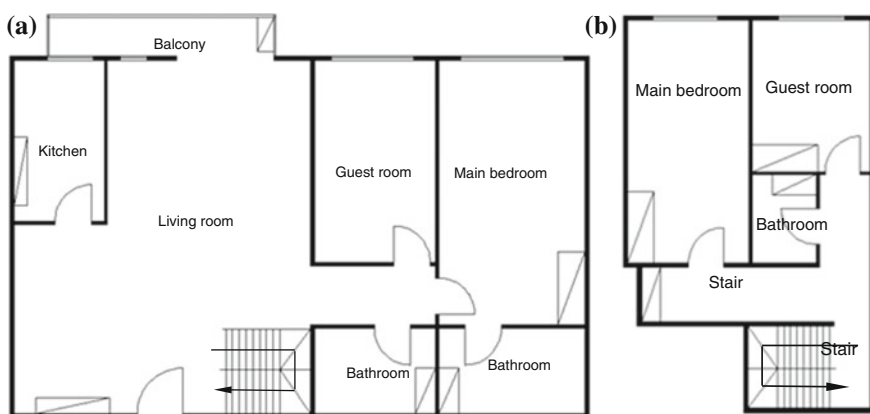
Configuration and furniture position of the tested house, “” represents the furniture. a First floor. b Second floor
